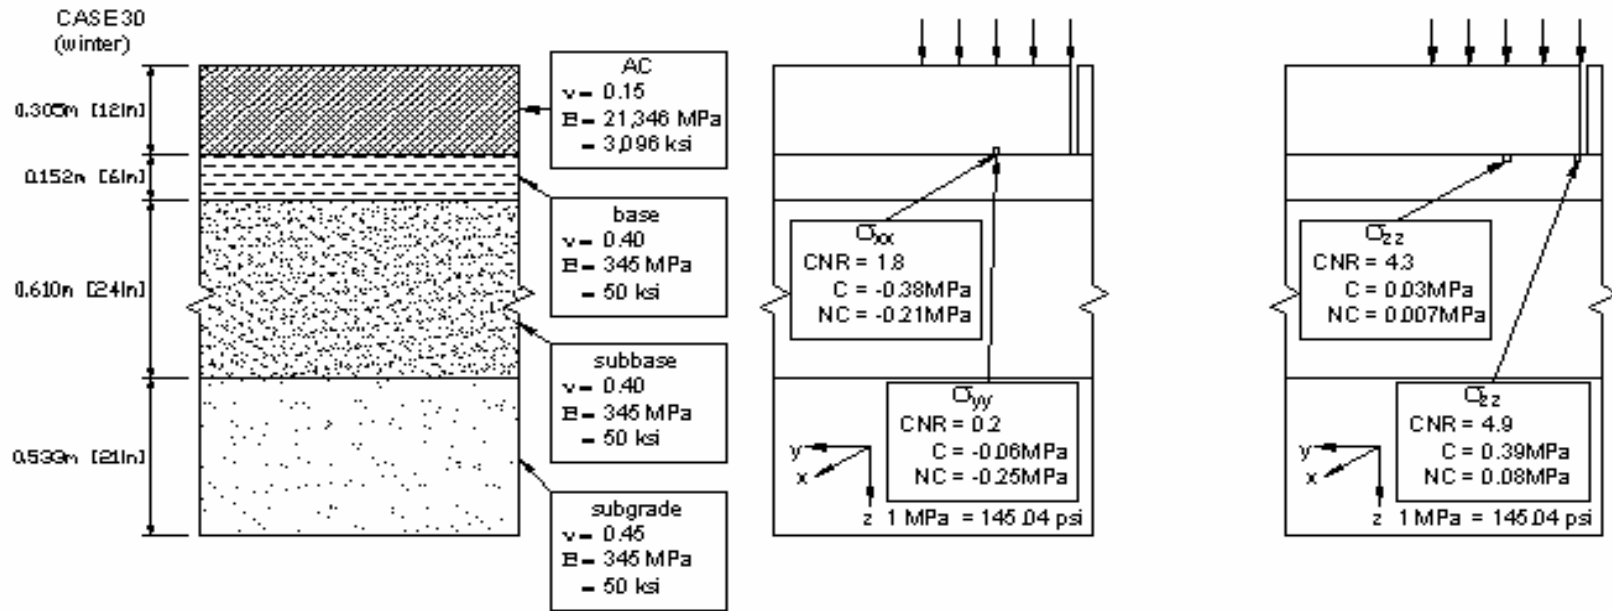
Summary cross section for case 30, (C – stress in cracked pavement, NC – stress in pavement with no crack, CNR – crack/no crack (stress) ratio)
